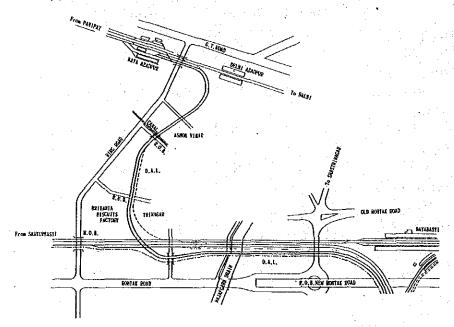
Conceptual Route - Rampura Improvement
